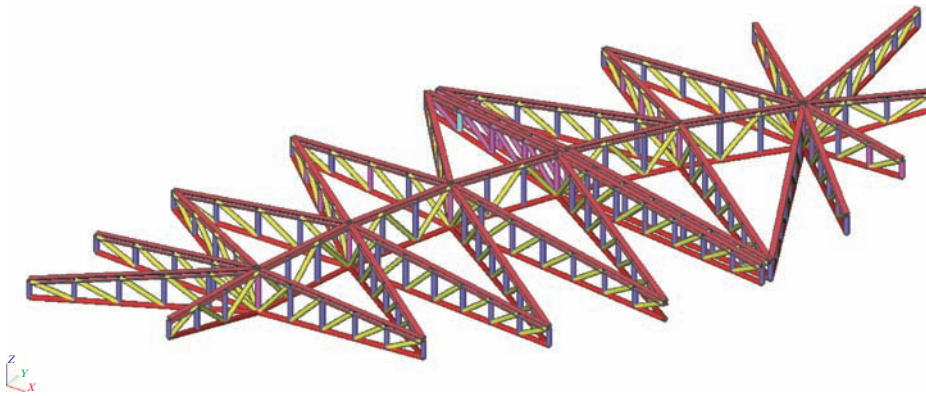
Three-dimensional structural model of the truss over the conference room (SCIA Engineer model)
